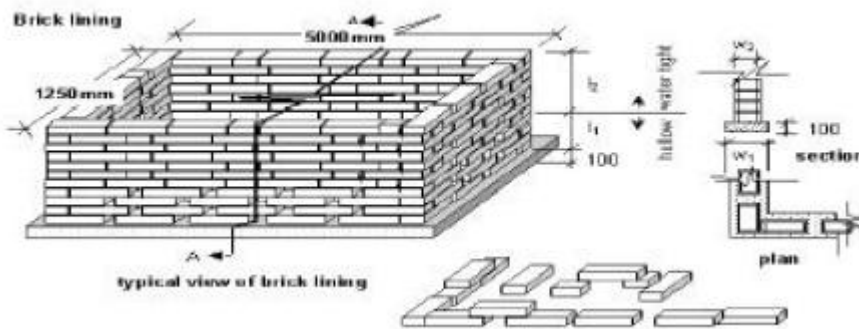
Brick laying schematic for pit illustrating honeycomb lining for bottom of lining, Source: Excreta Disposal in Emergencies, IFRC/Oxfam GB/UNHCR/UNICEF, 2004
